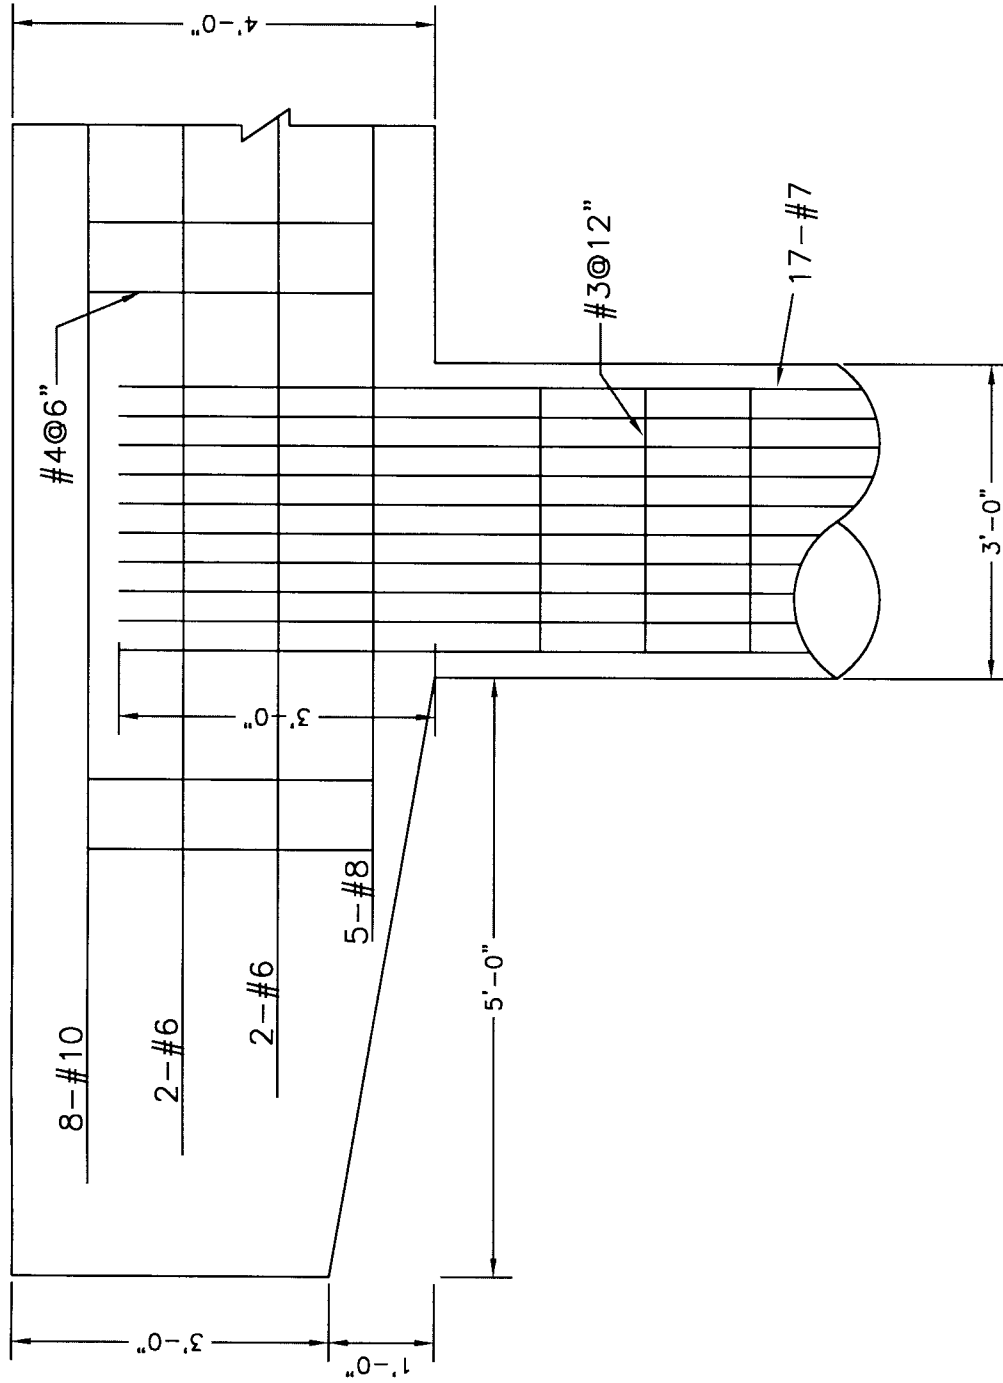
Joint Reinforcement of Column and Cap Beam
